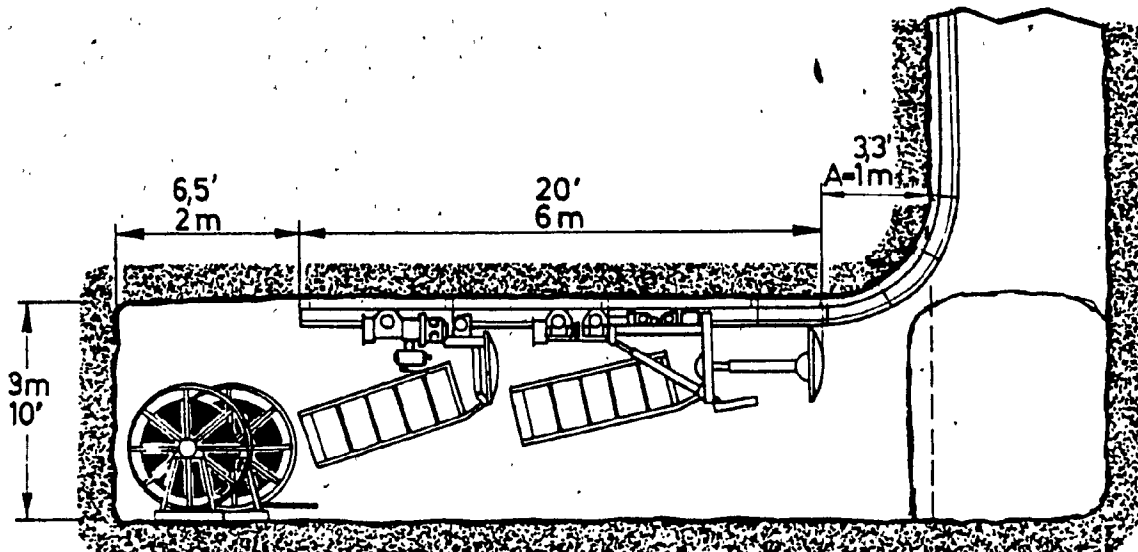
Dimensioning of Horizontal Cut out for a Vertical Shaft
